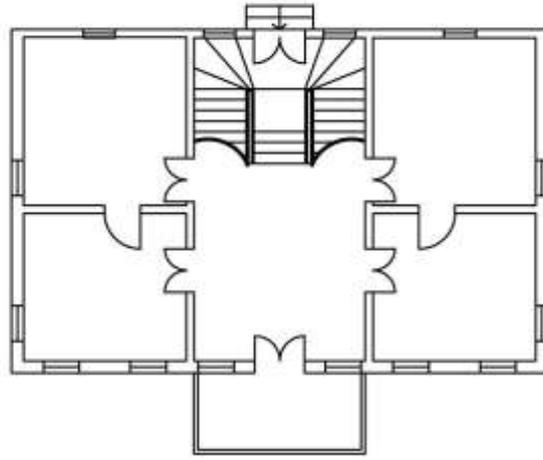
First floor of the house at 148 lot 1 parcel
